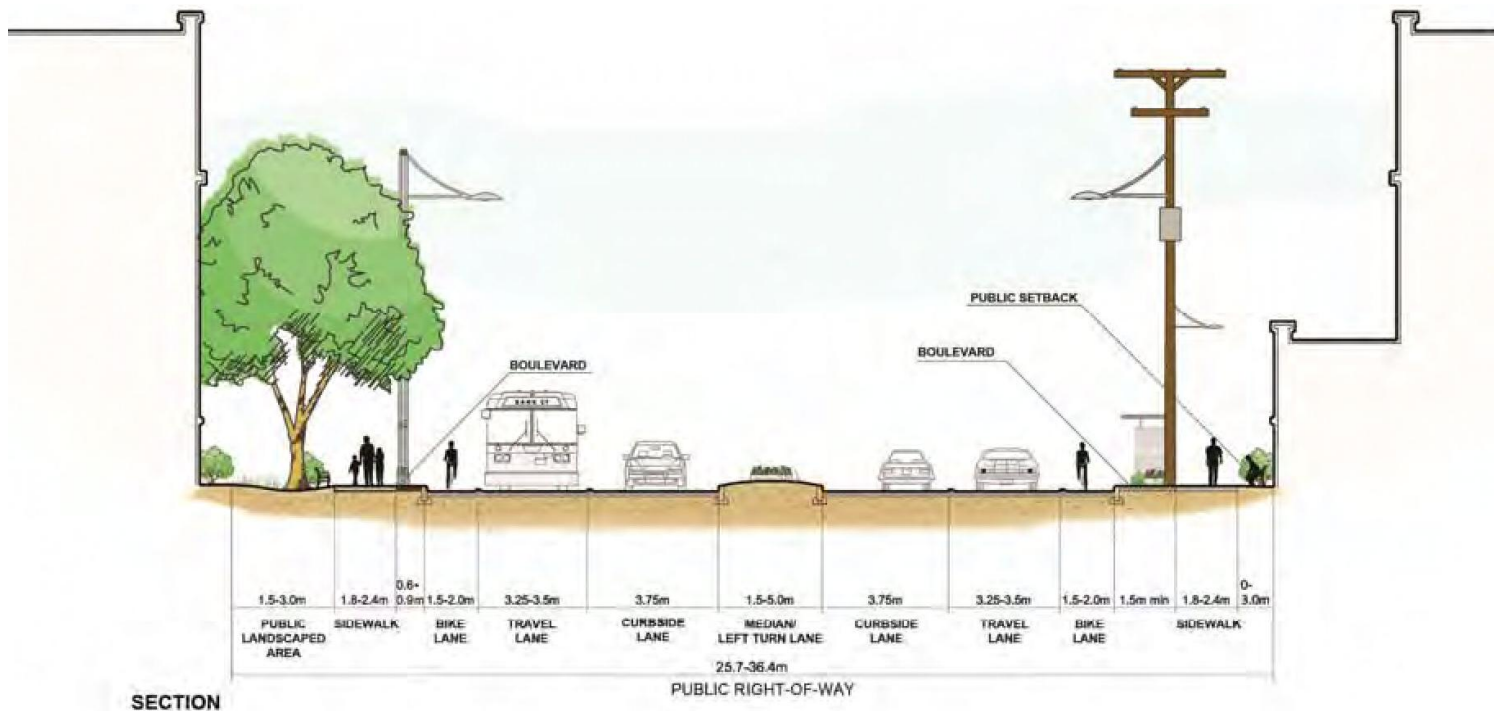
2012 CDP Proposed Bank Street Cross-Section
